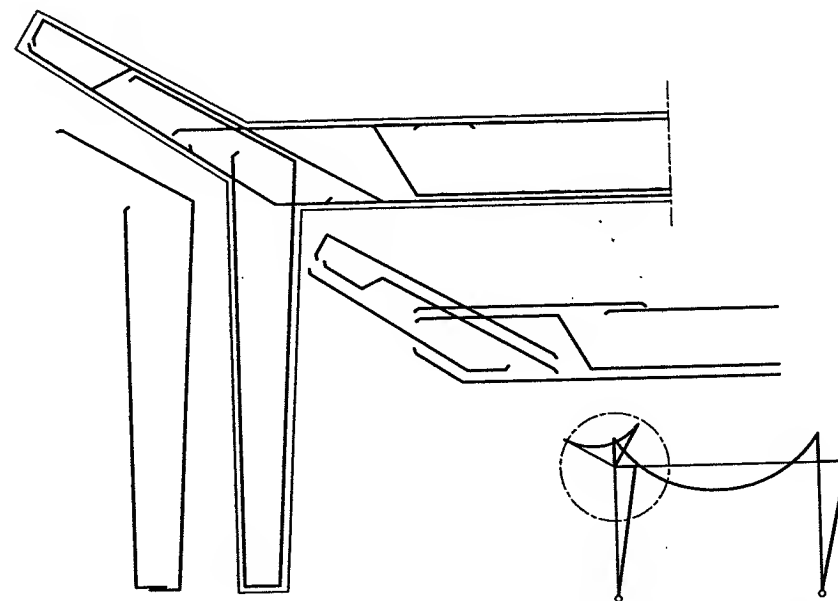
Detailing of Frame Joints (Detail-8)
